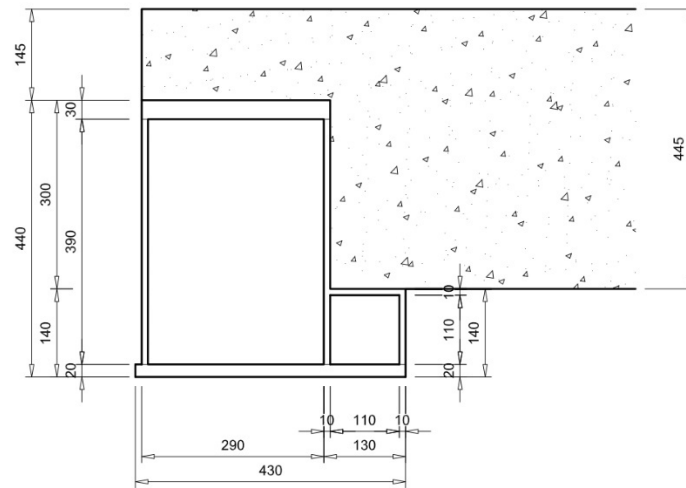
Section of the steel beam and concrete floor from the referenced building (Aluminium frame panel).
